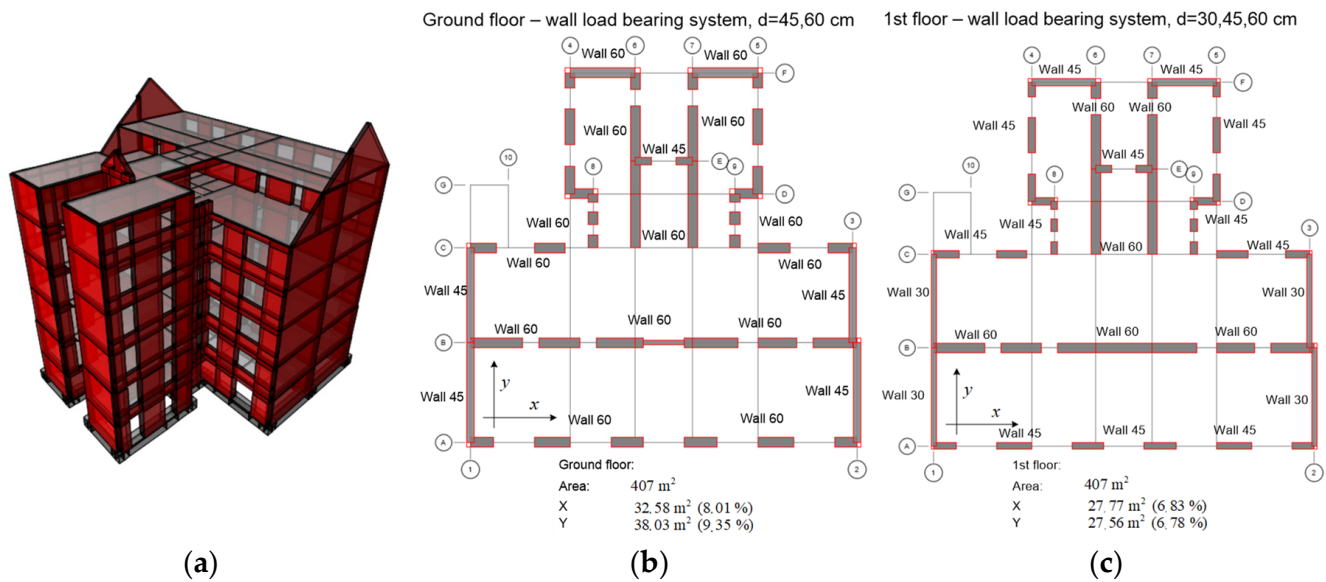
Numerical model of a building created in ETABS v.17. Vertical load-bearing system of masonry walls with dimensions by floors. (a) 3d numerical model; (b) layout of the walls on the ground floor; (c) layout of the walls in the first floor.
